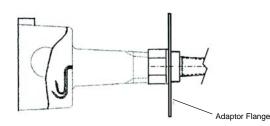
Mounting Duct Sensor Using Existing Mounting Plate.
